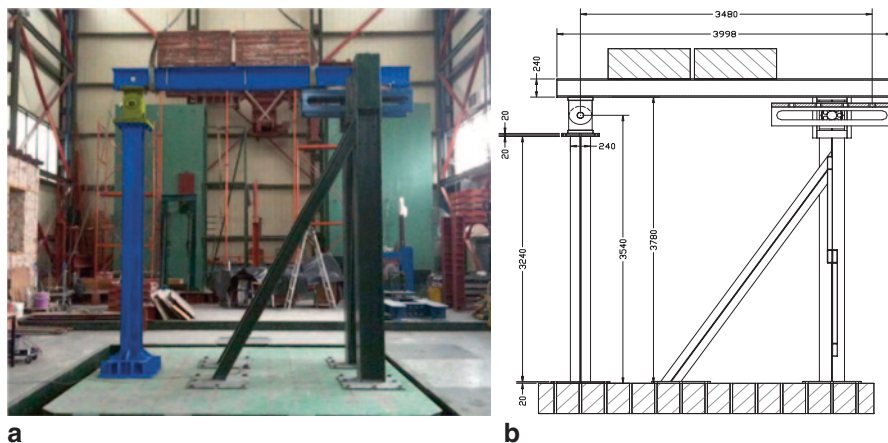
The specimen was used for the tests a Installation, b Sketch
